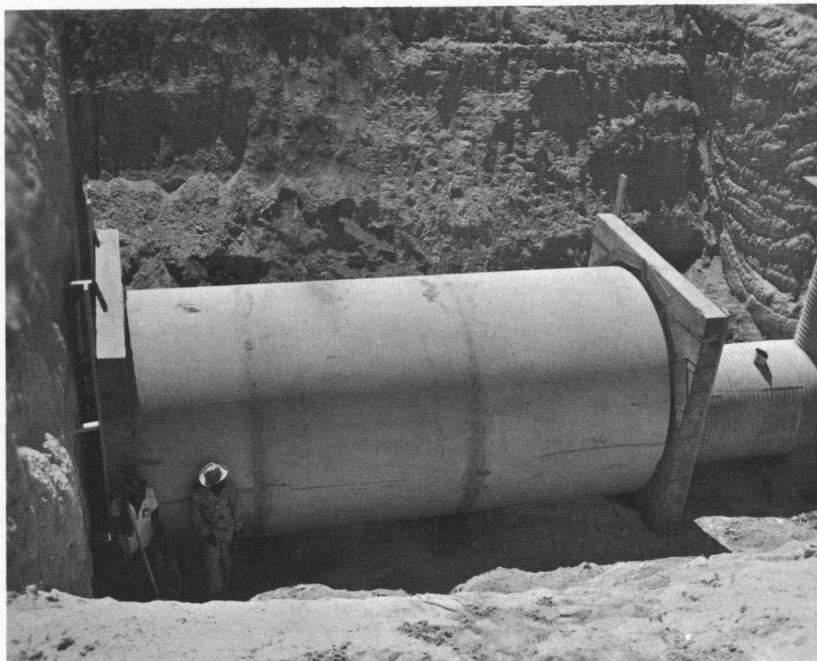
Exterior view of typical circular concrete conduit before backfilling.
